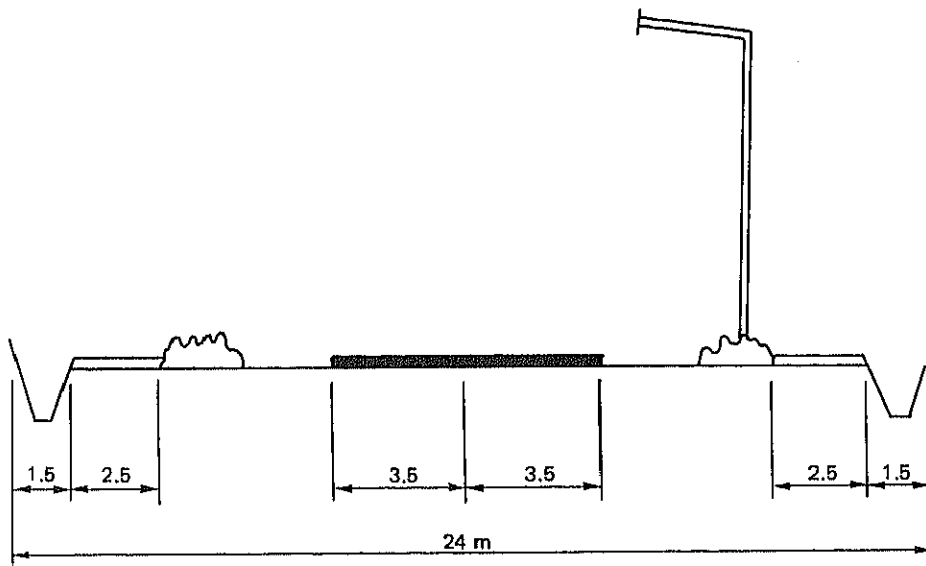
Temporary Branch Road Section (Urgent Plan)
